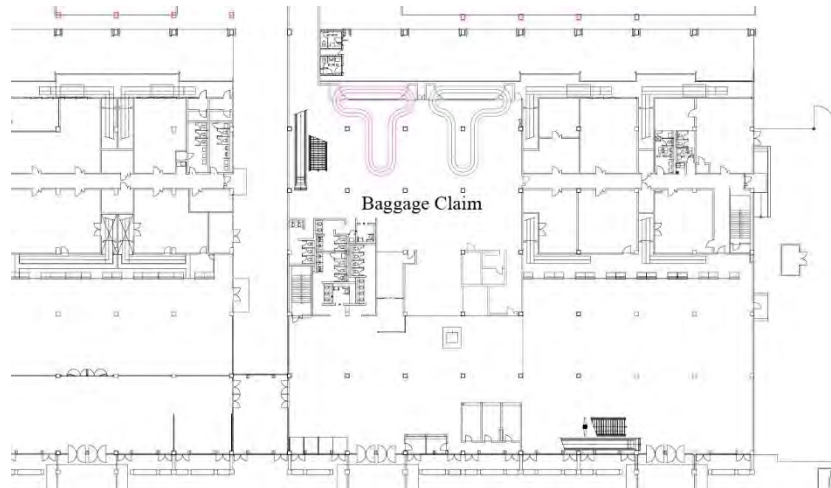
Additional Baggage Claim Belt in Domestic Passenger Terminal Building
